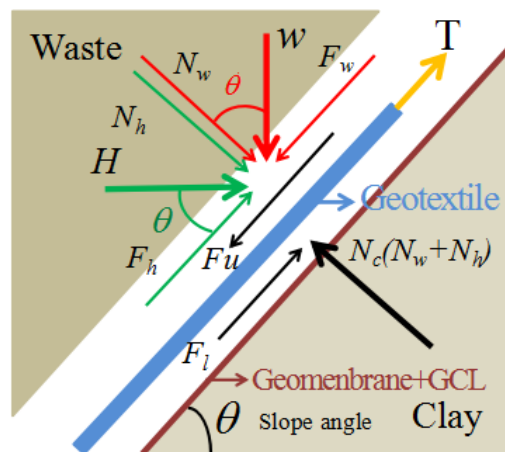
Forces acting on geotextile on a landfill side slope.
